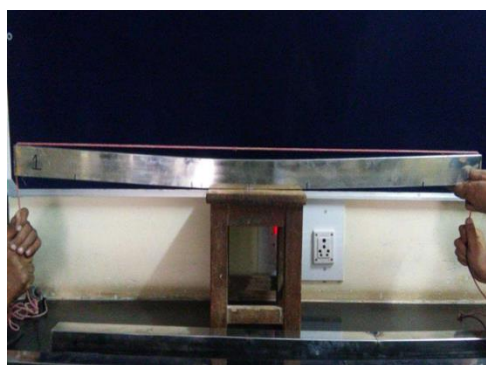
Bending of hollow specimen with slight crimping at points of application of load.
